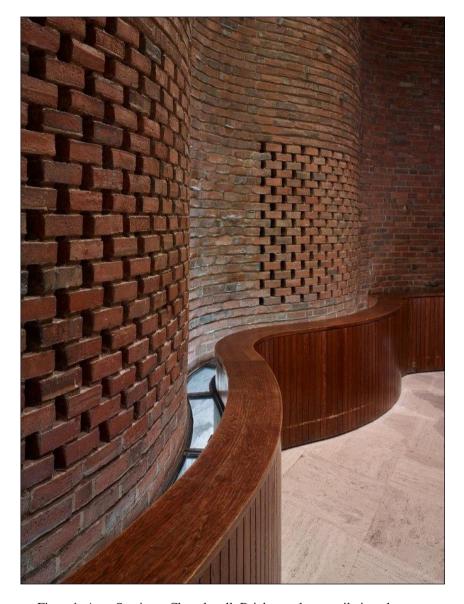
Aero Saarinen, Chapel wall. Bricks used as ventilation elements
